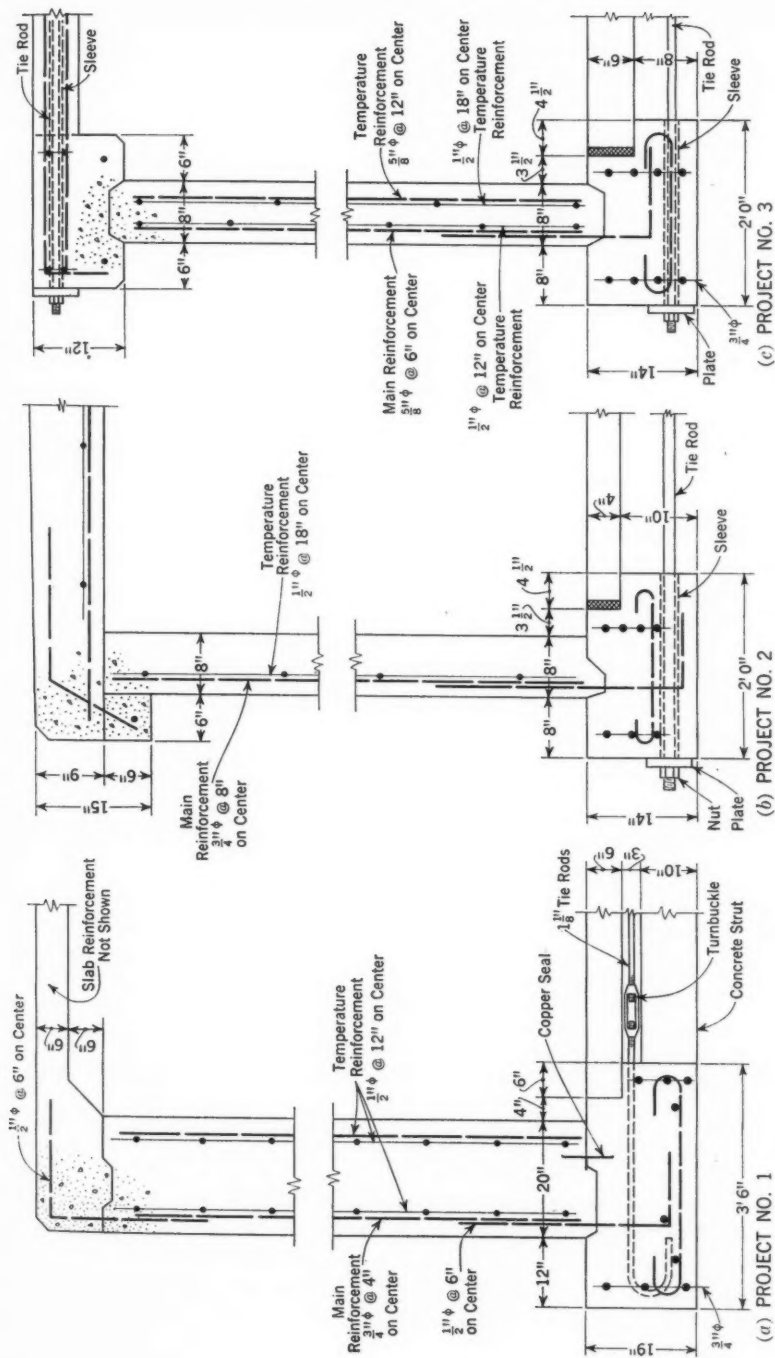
TYPICAL DETAILS OF SIDE-WALLS
